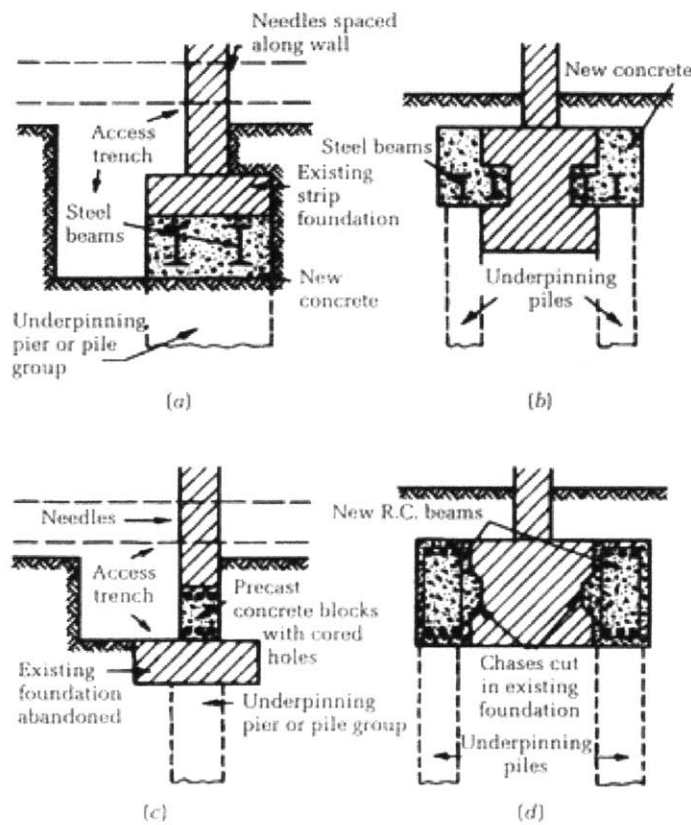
Methods of Underpinning Wall Foundations Using Beams Spanning Between Piles [10]
